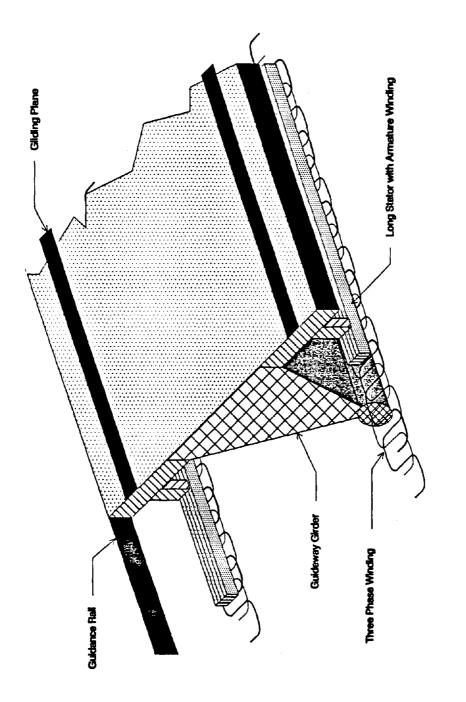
AXONOMETRIC VIEW OF GUIDEWAY
